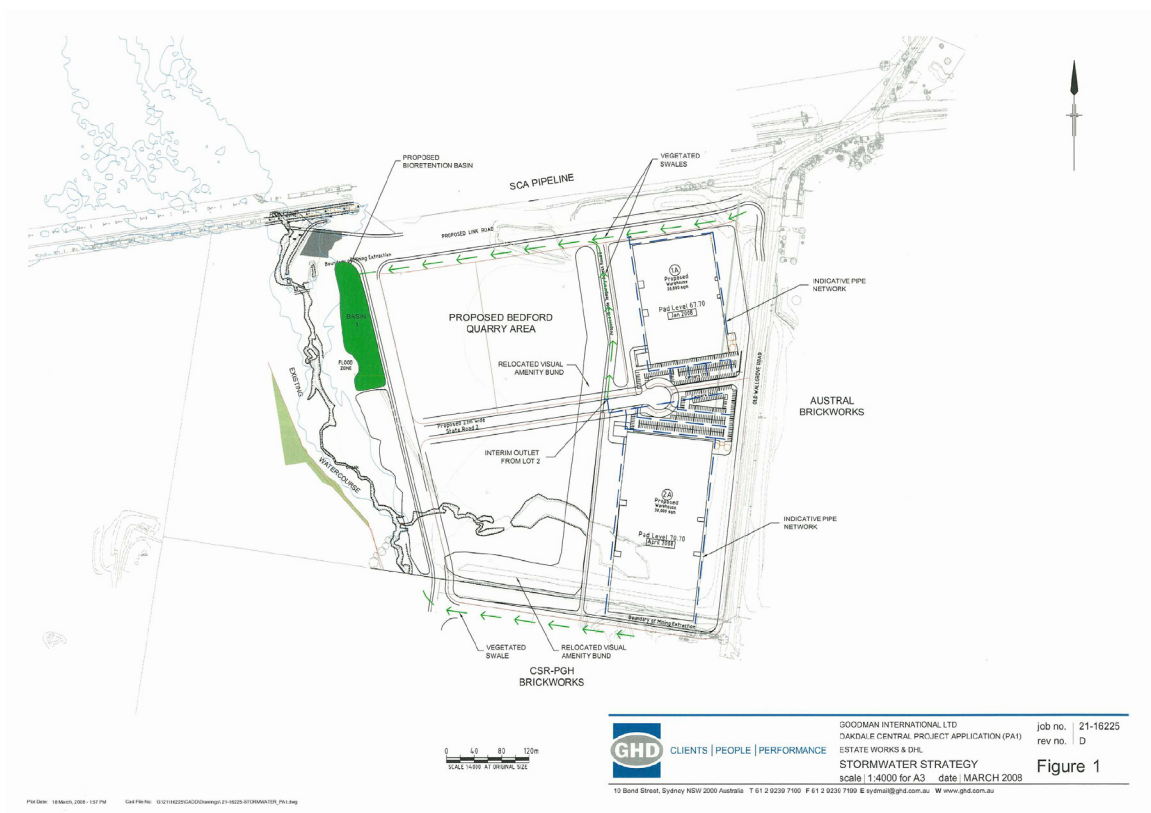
DHL Facilities Stormwater Management Strategy Plan
